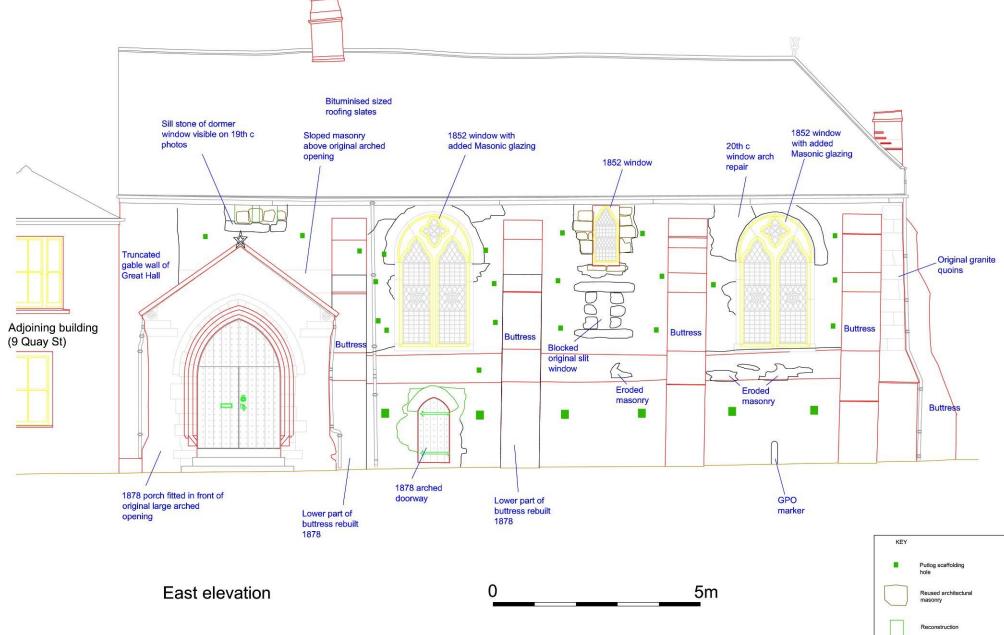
Exterior elevation of east wall (Quay Street frontage)
